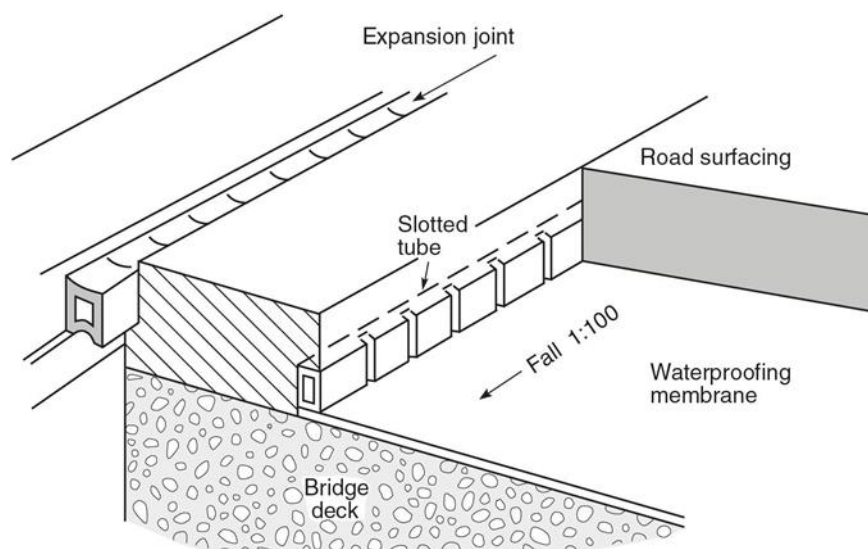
Typical detail for provision of sub-surface drainage at expansion joints using transverse slotted drains (Source Ref 1.I)
